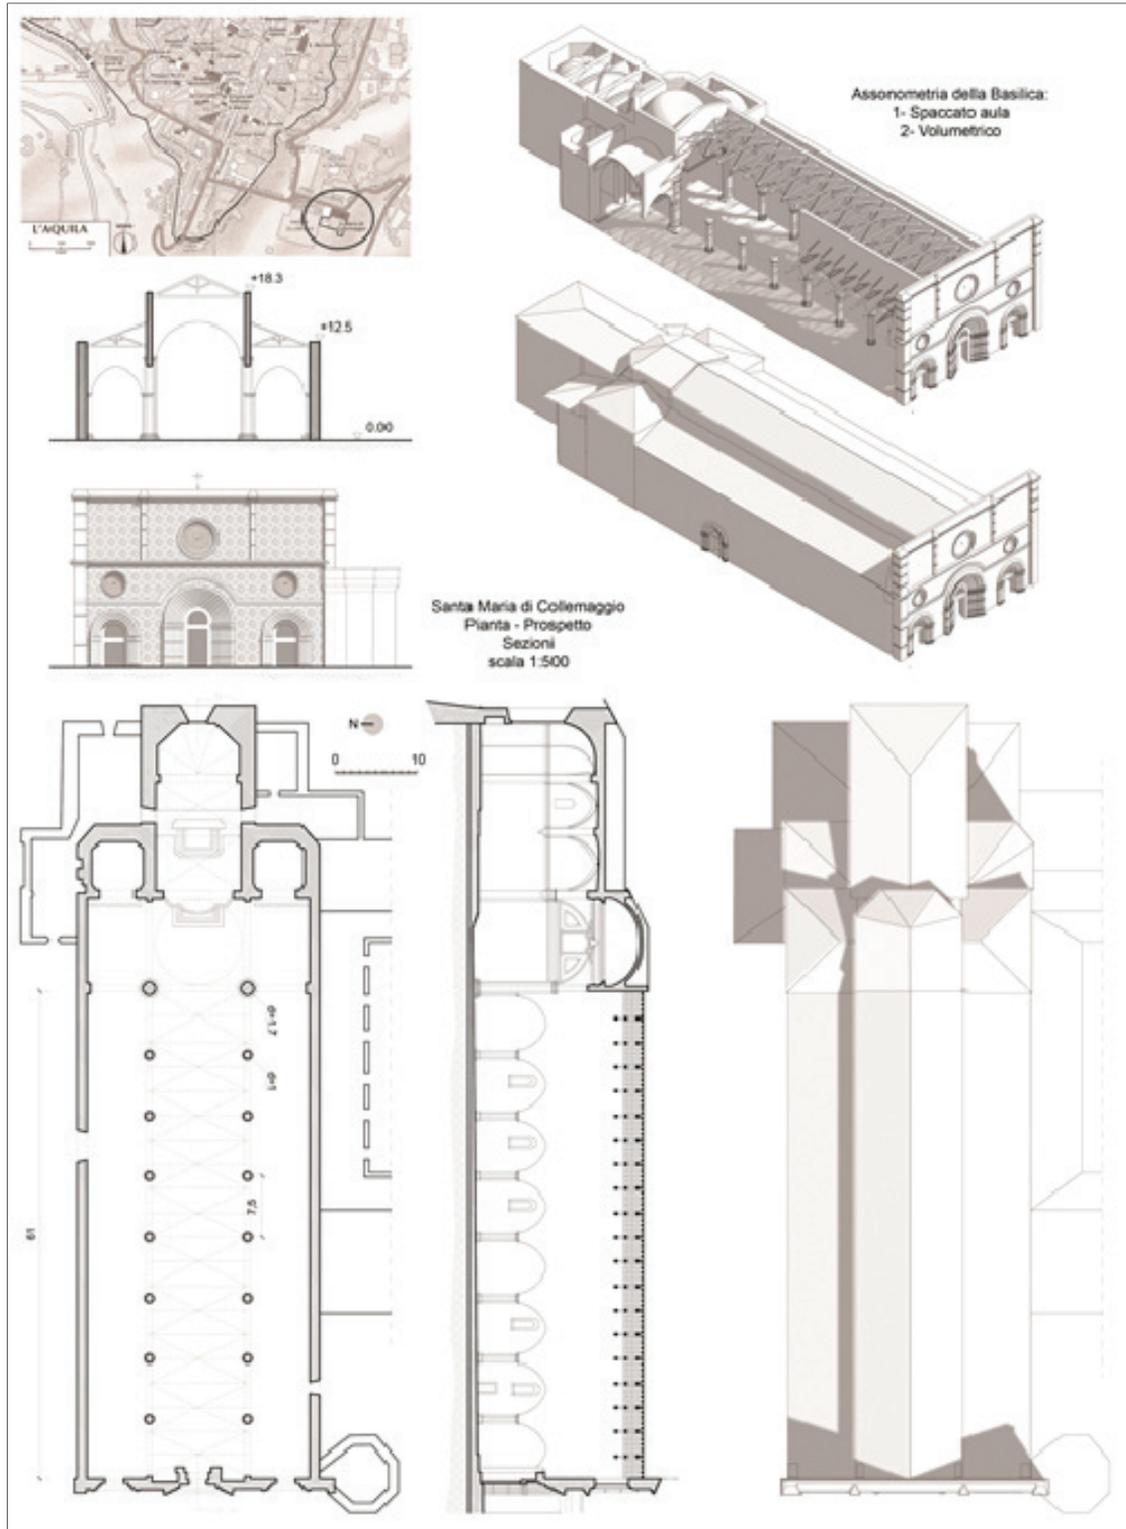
Frontal and cross-section isometric view of the Basilica
